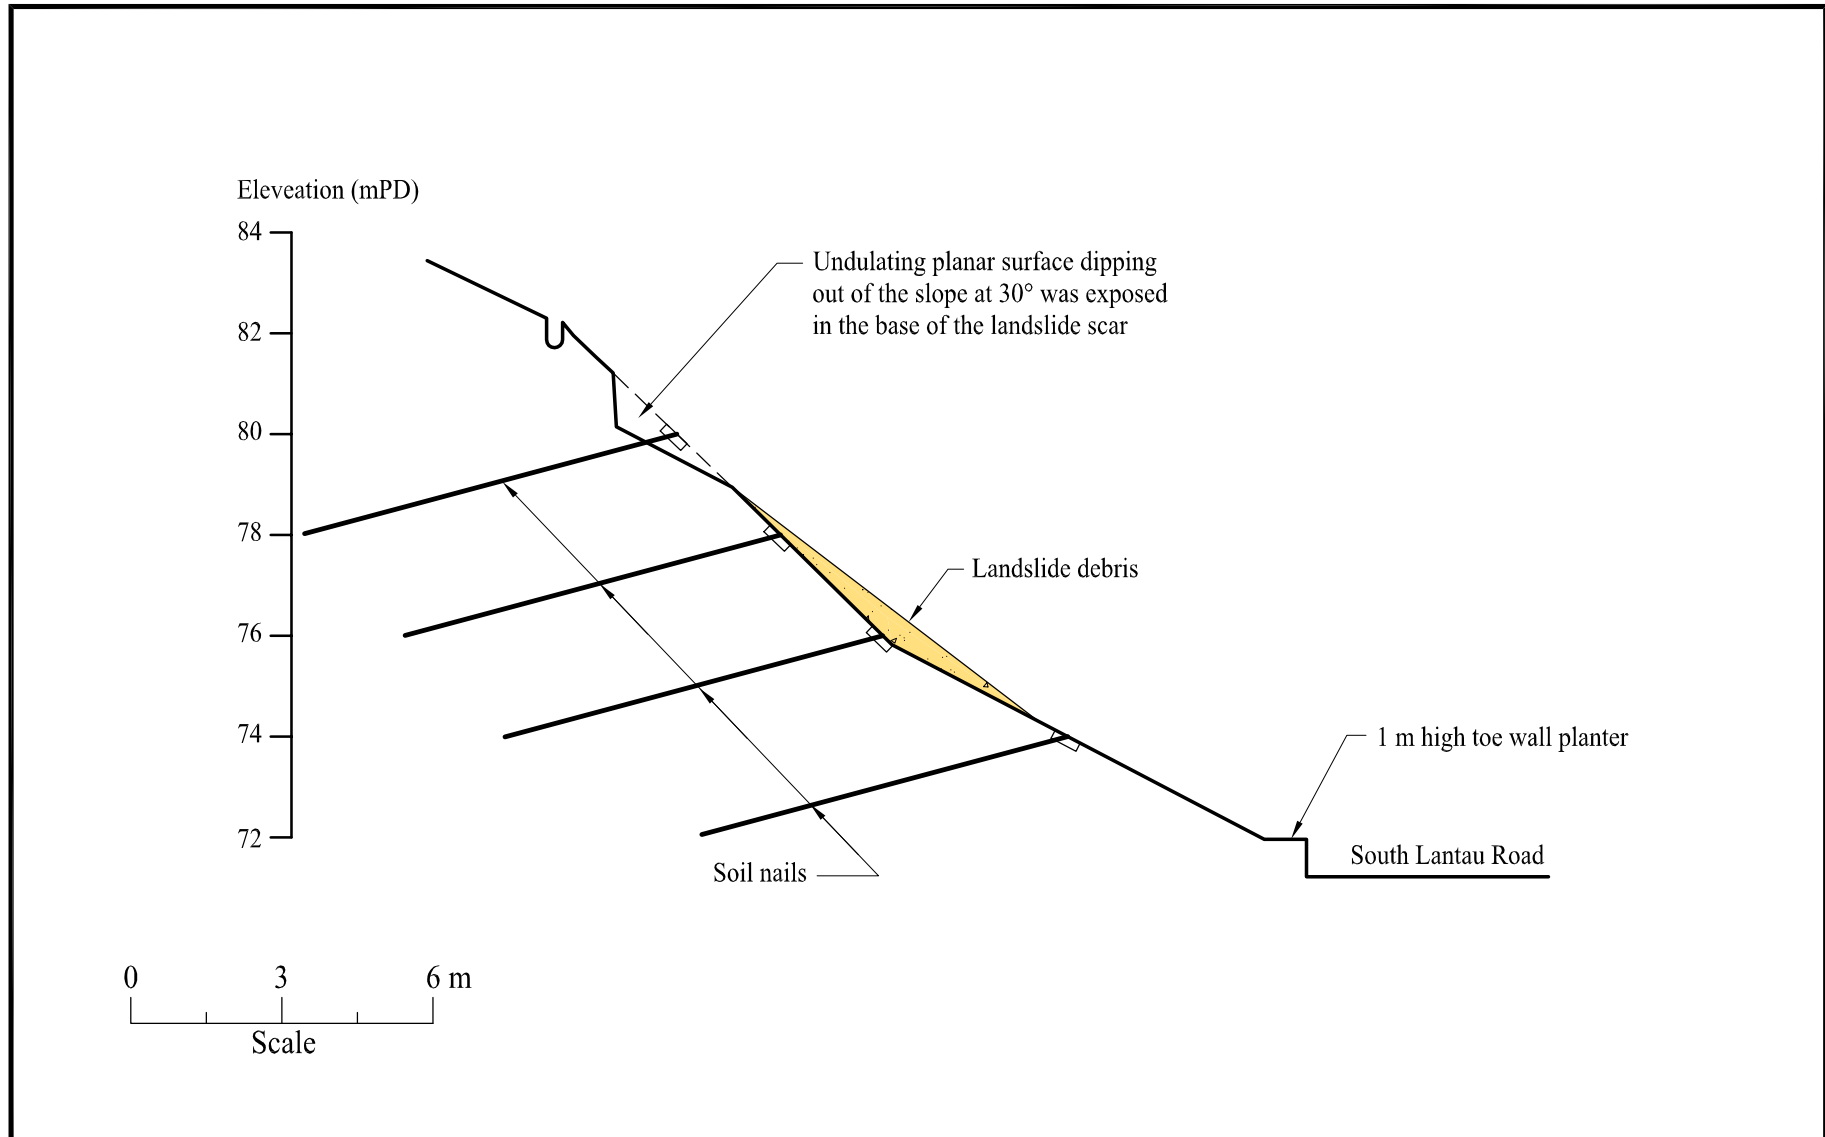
Section through Landslide Scar at Slope No. 13NE-A/C102 (Section B - B in Figure 8)
